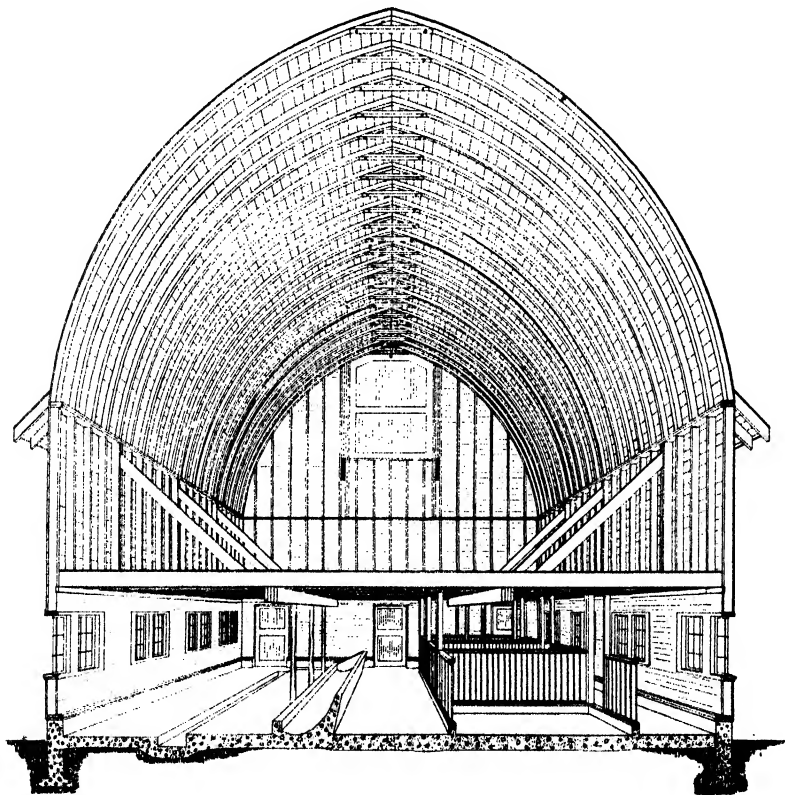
An interior perspective of a self-supporting Gothic roof having laminated rafters on a wing joist frame. A 4"x4" collar joist about 4-ft. long bolted to the rafter at each end tends to prevent sagging at the ridge.
